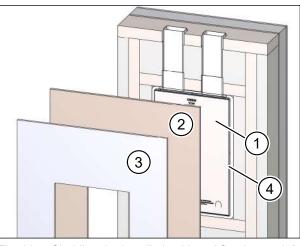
Cladding the installation kit and flat ductwork / flexible pipes on the inside
